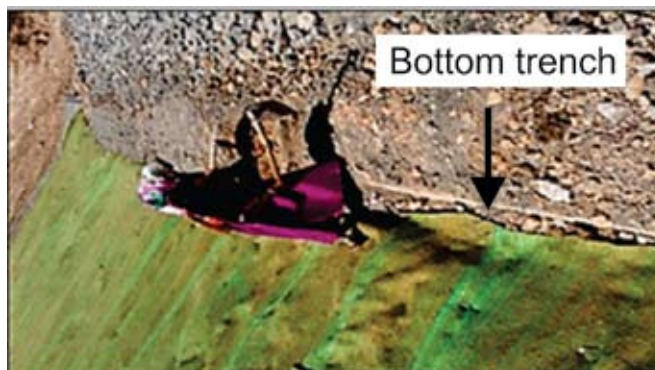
View showing the bottom trench for inserting geotextile's bottom edge near toe wall
